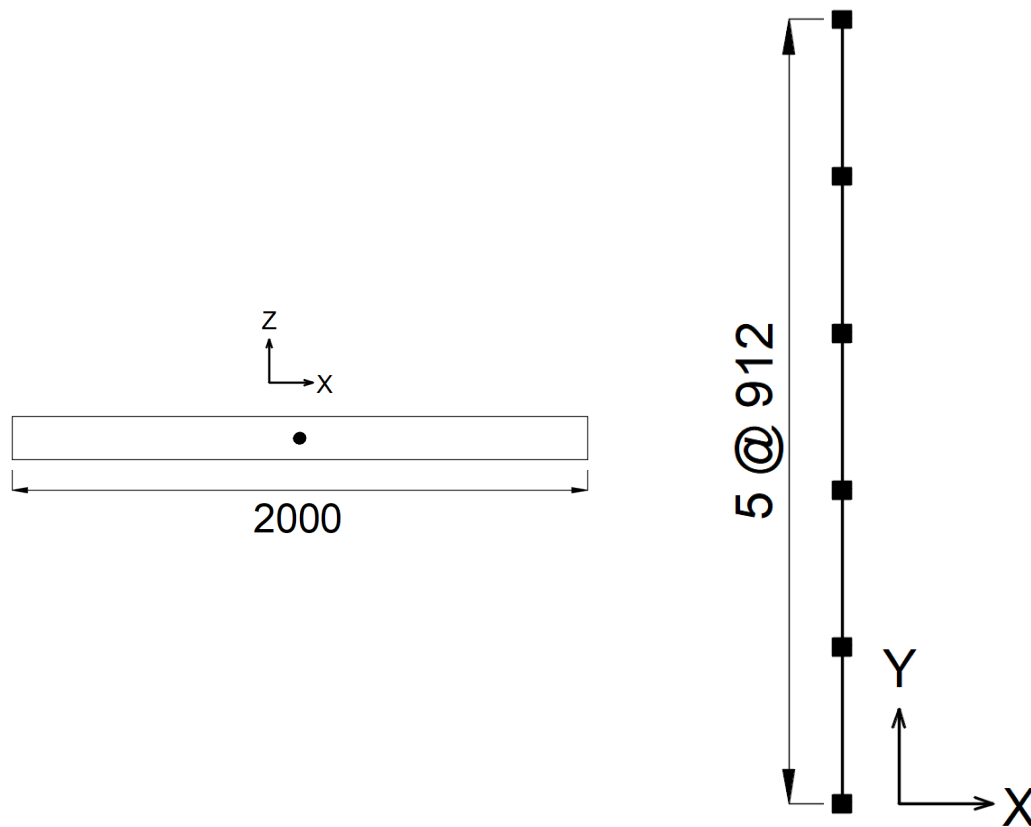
Plan and elevation views of the wide-column model for WSH4 [Unit: *mm*].
